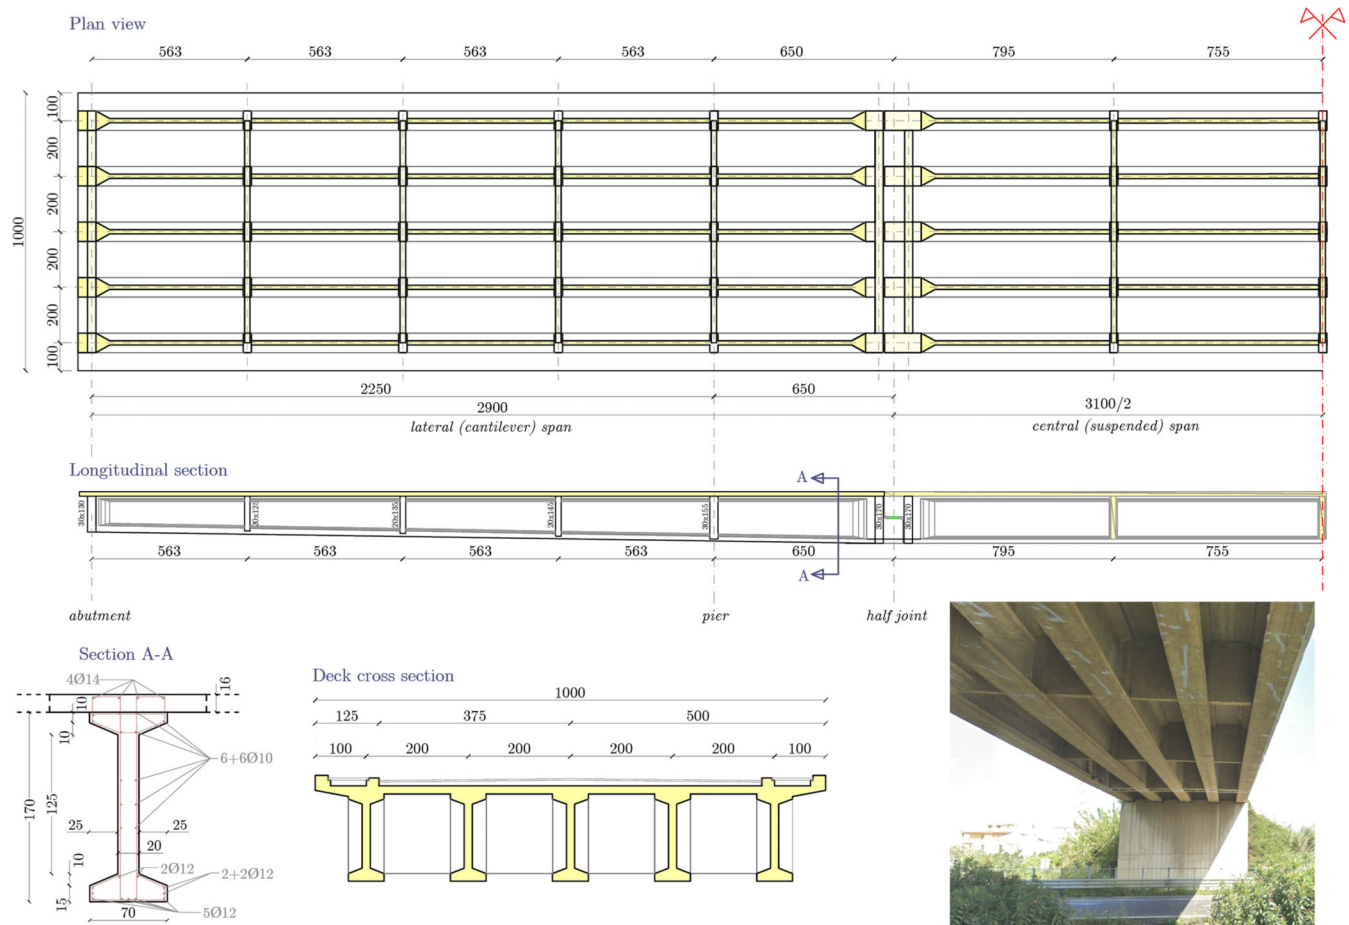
Drawings of the bridge deck with five girders, measures in (cm): Plan view (top), longitudinal section of half deck (middle), girder cross section and cross section of the entire deck along with a photograph of the deck soffit (bottom).
